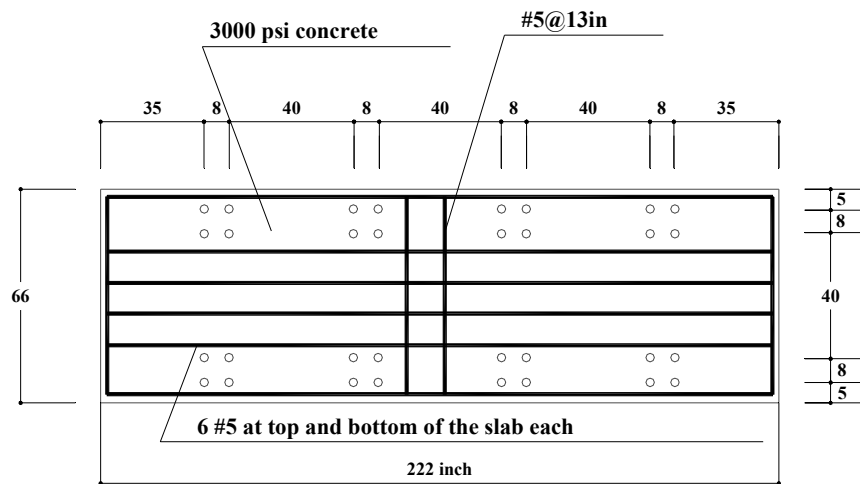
Plan view of foundation layout (dimensions are in inches)
